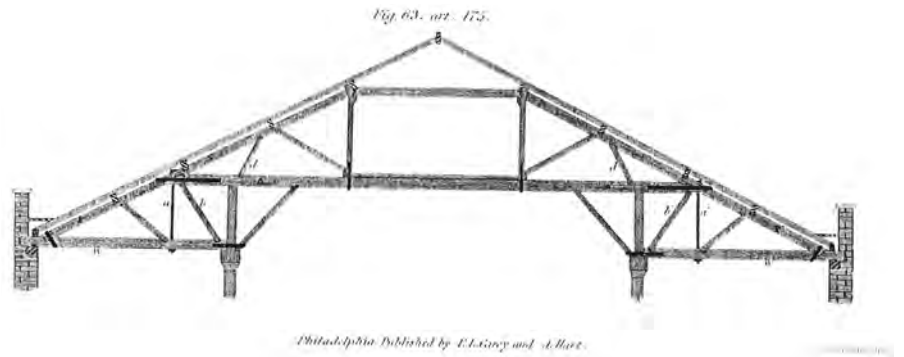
Roof truss (Tredgold, 1837, 1820, Plate 9, Figure 63).
